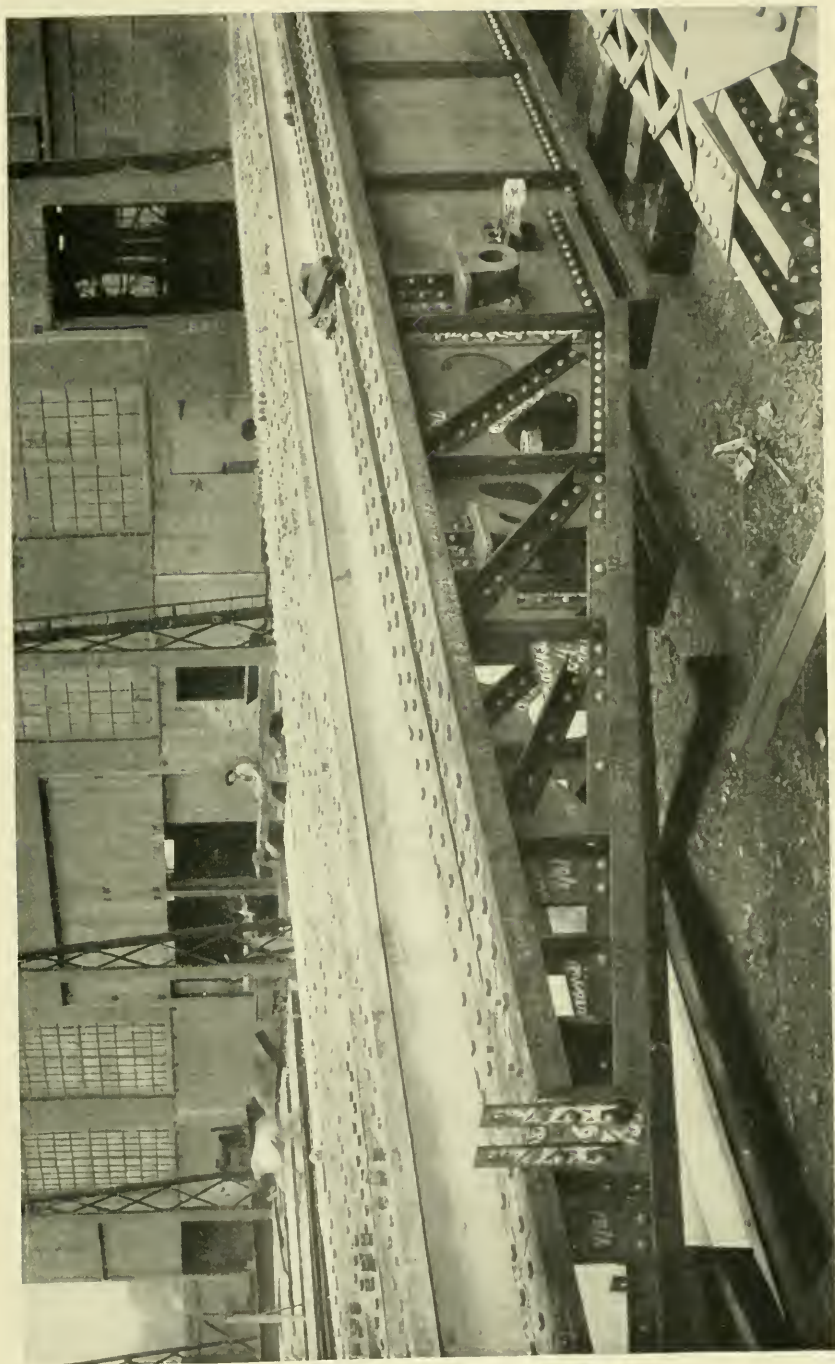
BRACKET END OF TYPICAL FLOOR BEAM OF NEW CITY BRIDGE, BEFORE CONCRETING.
